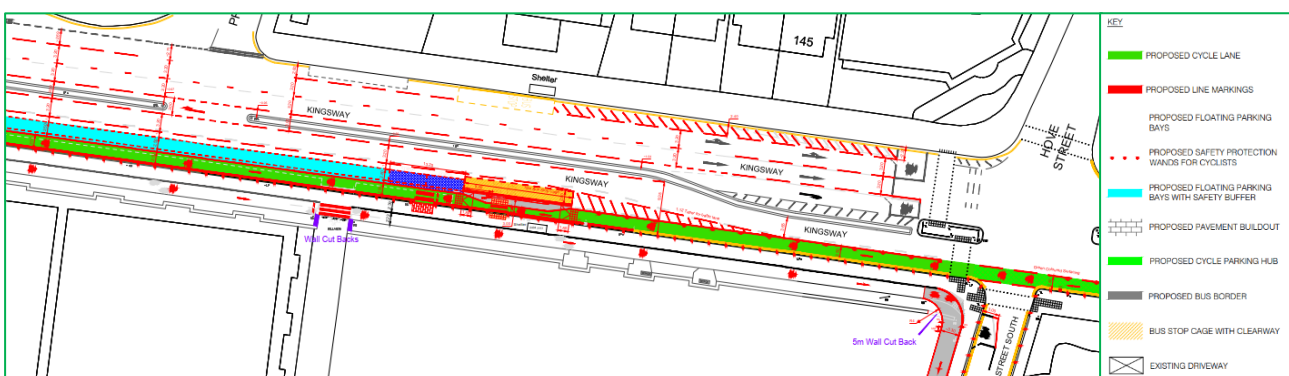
A259 Walking, Cycling and Accessibility Scheme - Extract (West of Hove Street)
